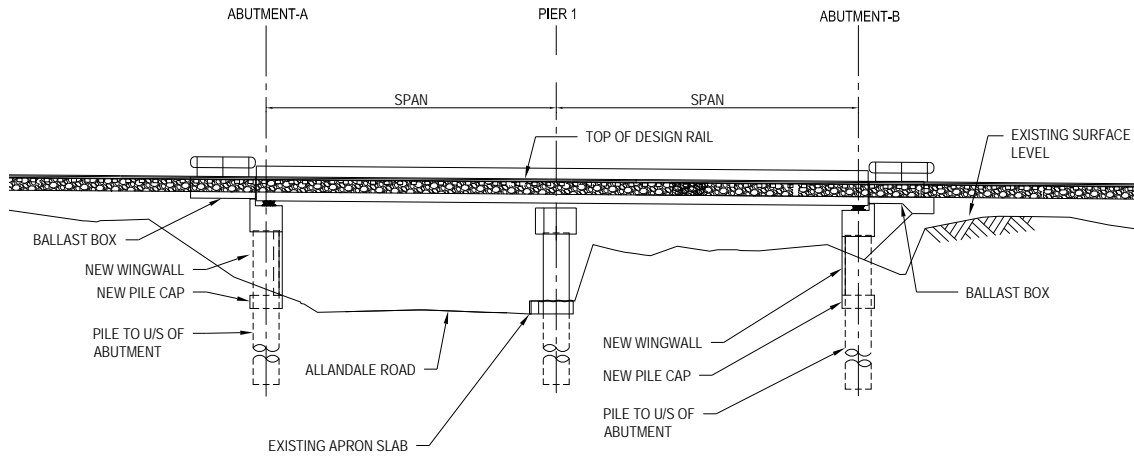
Proposed Allandale Road Underbridge Design Schematic
